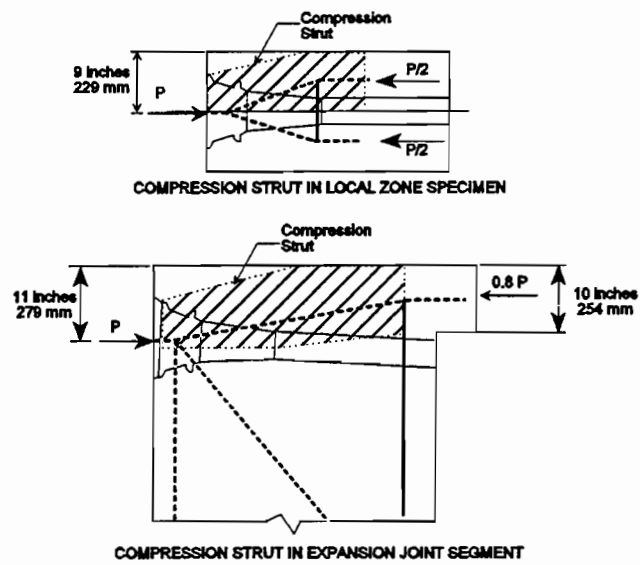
Comparison of compression struts in local zone test specimen and in expansion joint segment.
